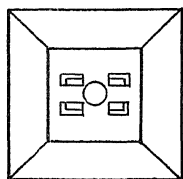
Anchor Plate with Lugs for Holding Bolt Head.
